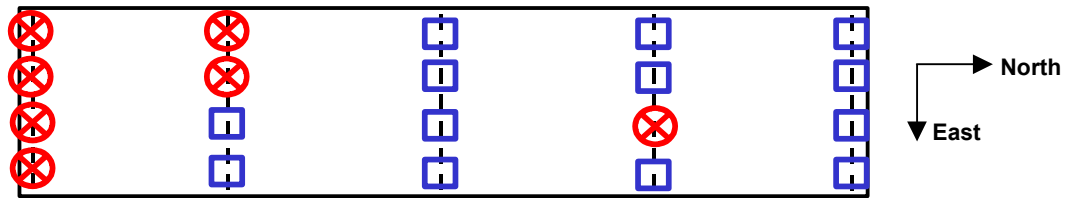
Locations of failed puddle welds after Test #8 (DDR = 1.52 %)
